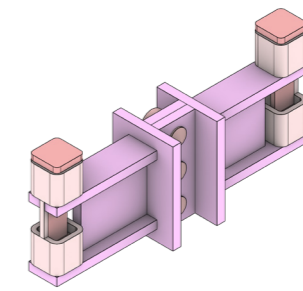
Insert detail- beam-to-beam connection | Source: Author
